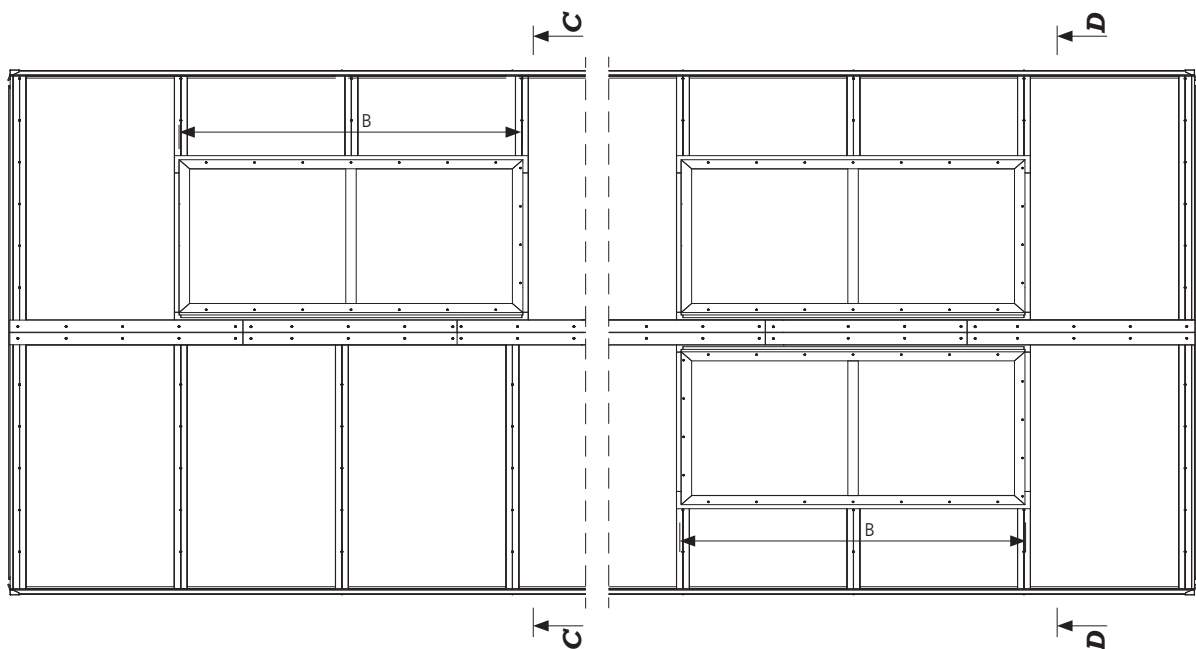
Top view of mcr PROLIGHT triangular shaped continuous rooflight with daily ventilation single-leaf and double-leaf vent
